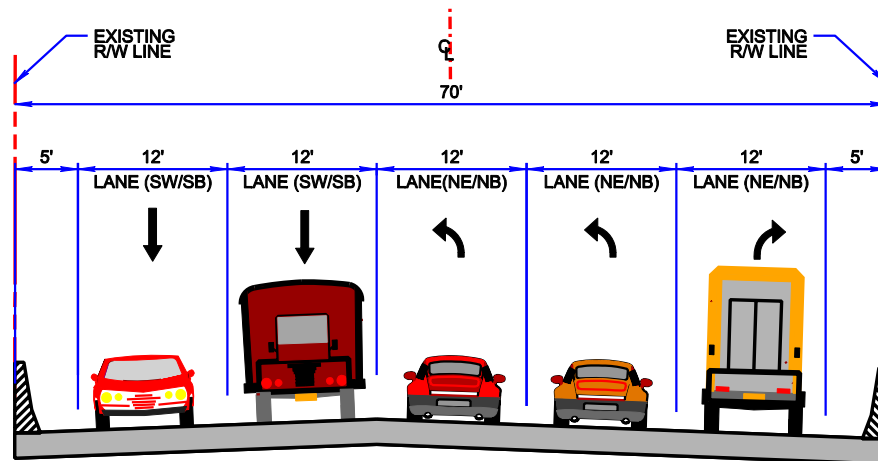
M 5-Lane Typical Bridge Section at NW 107th Avenue (2008) and NW 121st Way (2018)
